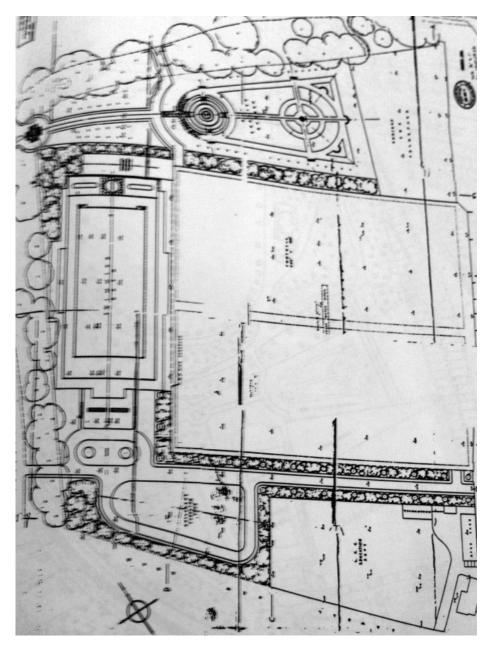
1930 plan showing the proposed layout for the Kennington Park extension
